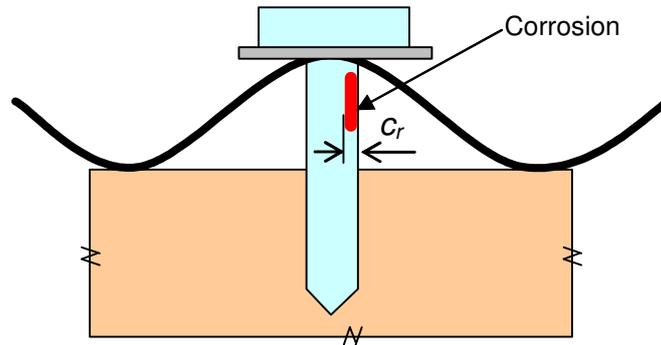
Depth of corrosion on exposed part of fasteners under corrugated roofing
